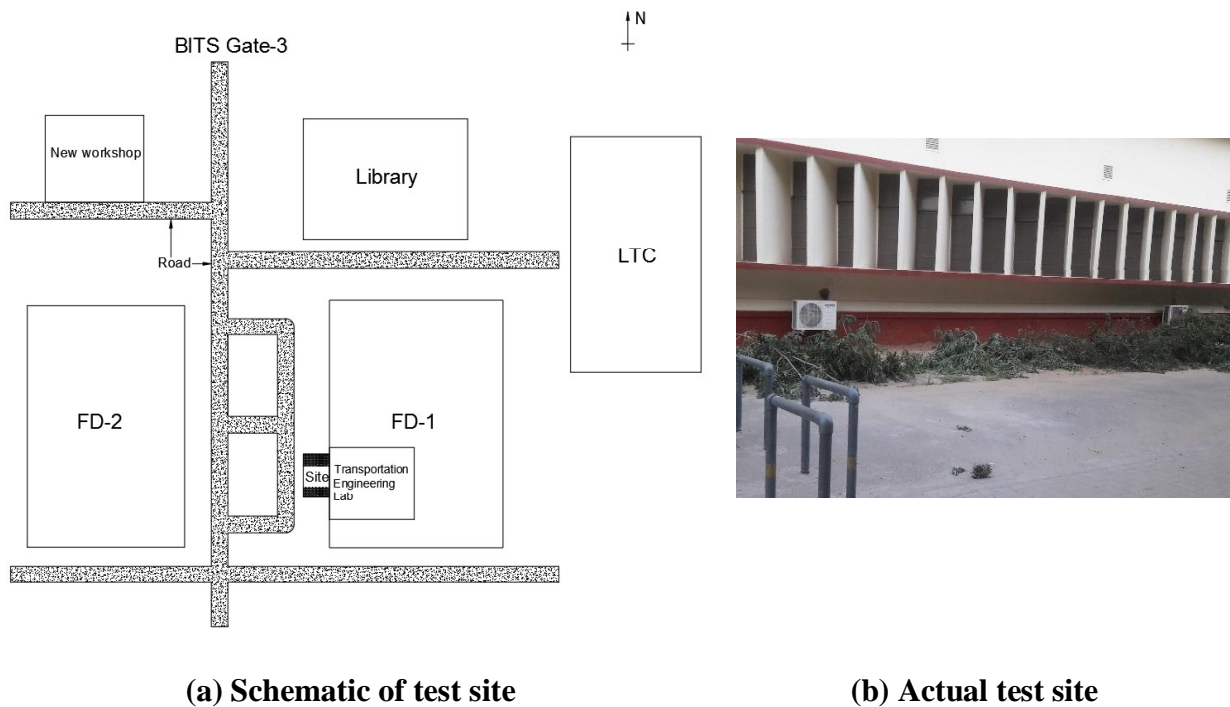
Location of the test section at BITS Pilani- Pilani campus
